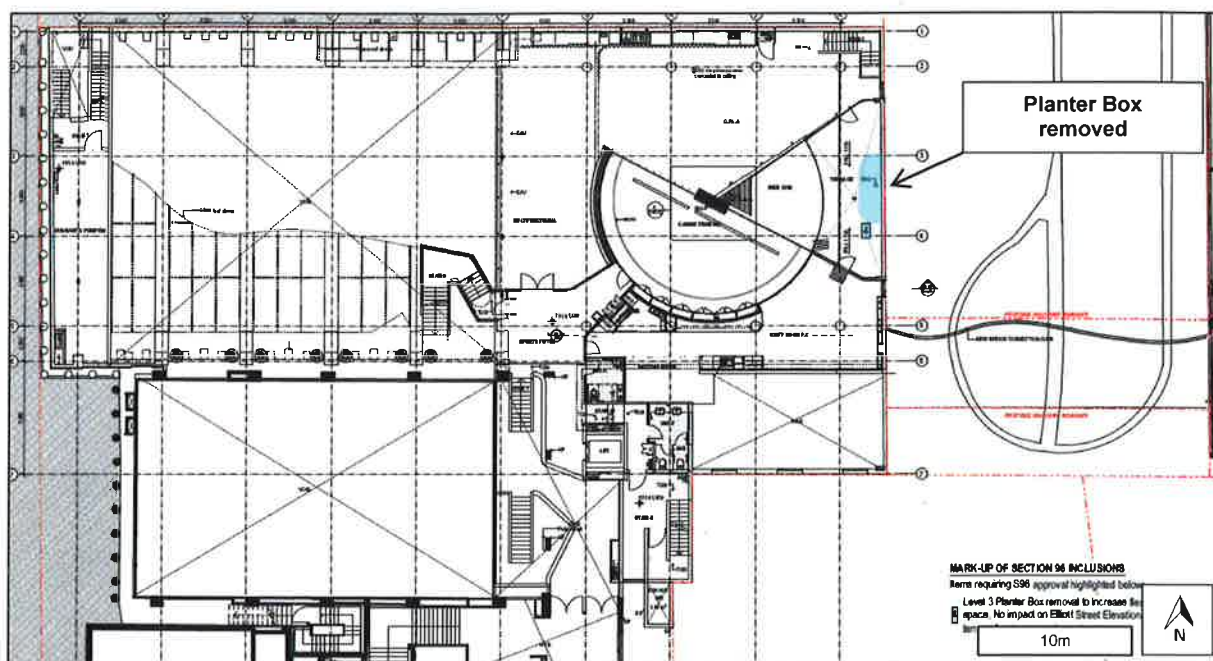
Extract from proposed level 3 floor plan (source: Application documents, 2018)
